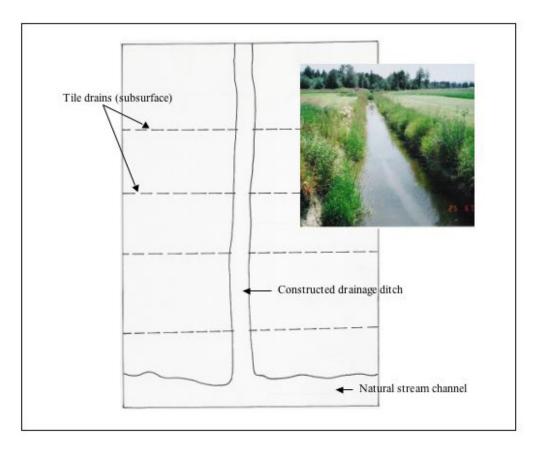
A typical drainage plan in which parallel subsurface tile drains discharge into a surface collector ditch.
